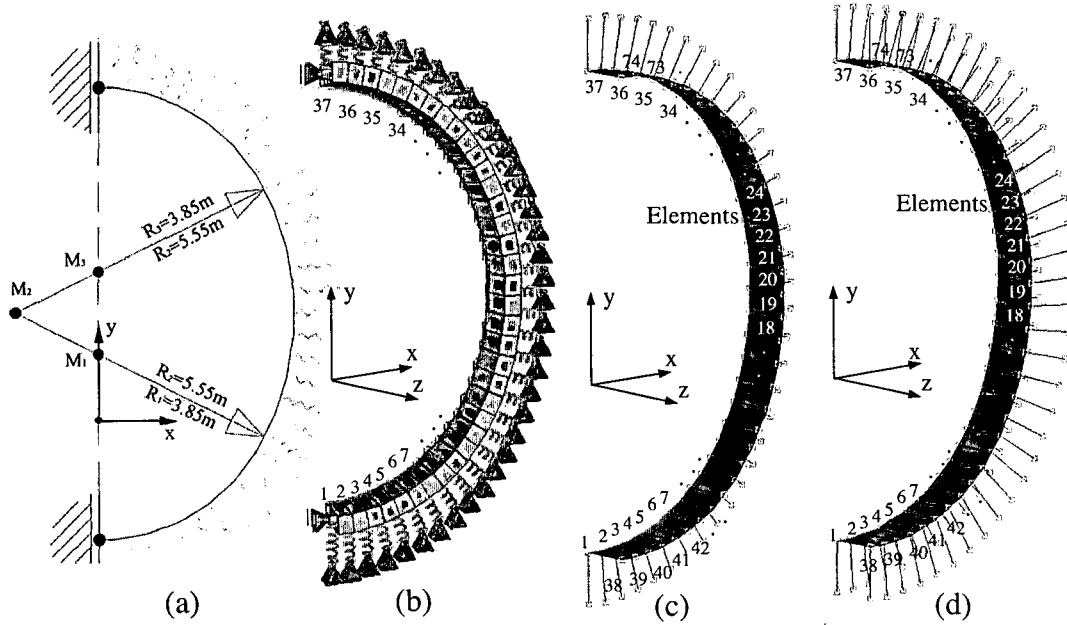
Tunnel cross-section: (a) geometric dimensions and FE models used in (b) SOFISTIK, (c) MARC-single row, and (d) MARC-double row
